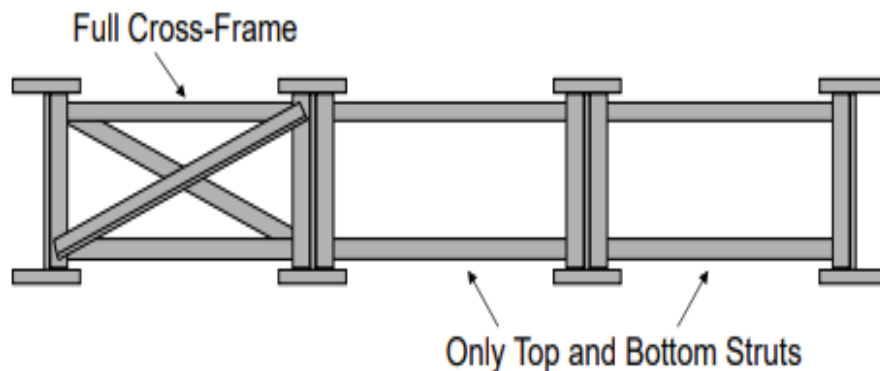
Lean-on bracing with cross-frame (FHWA Bracing Systems)
